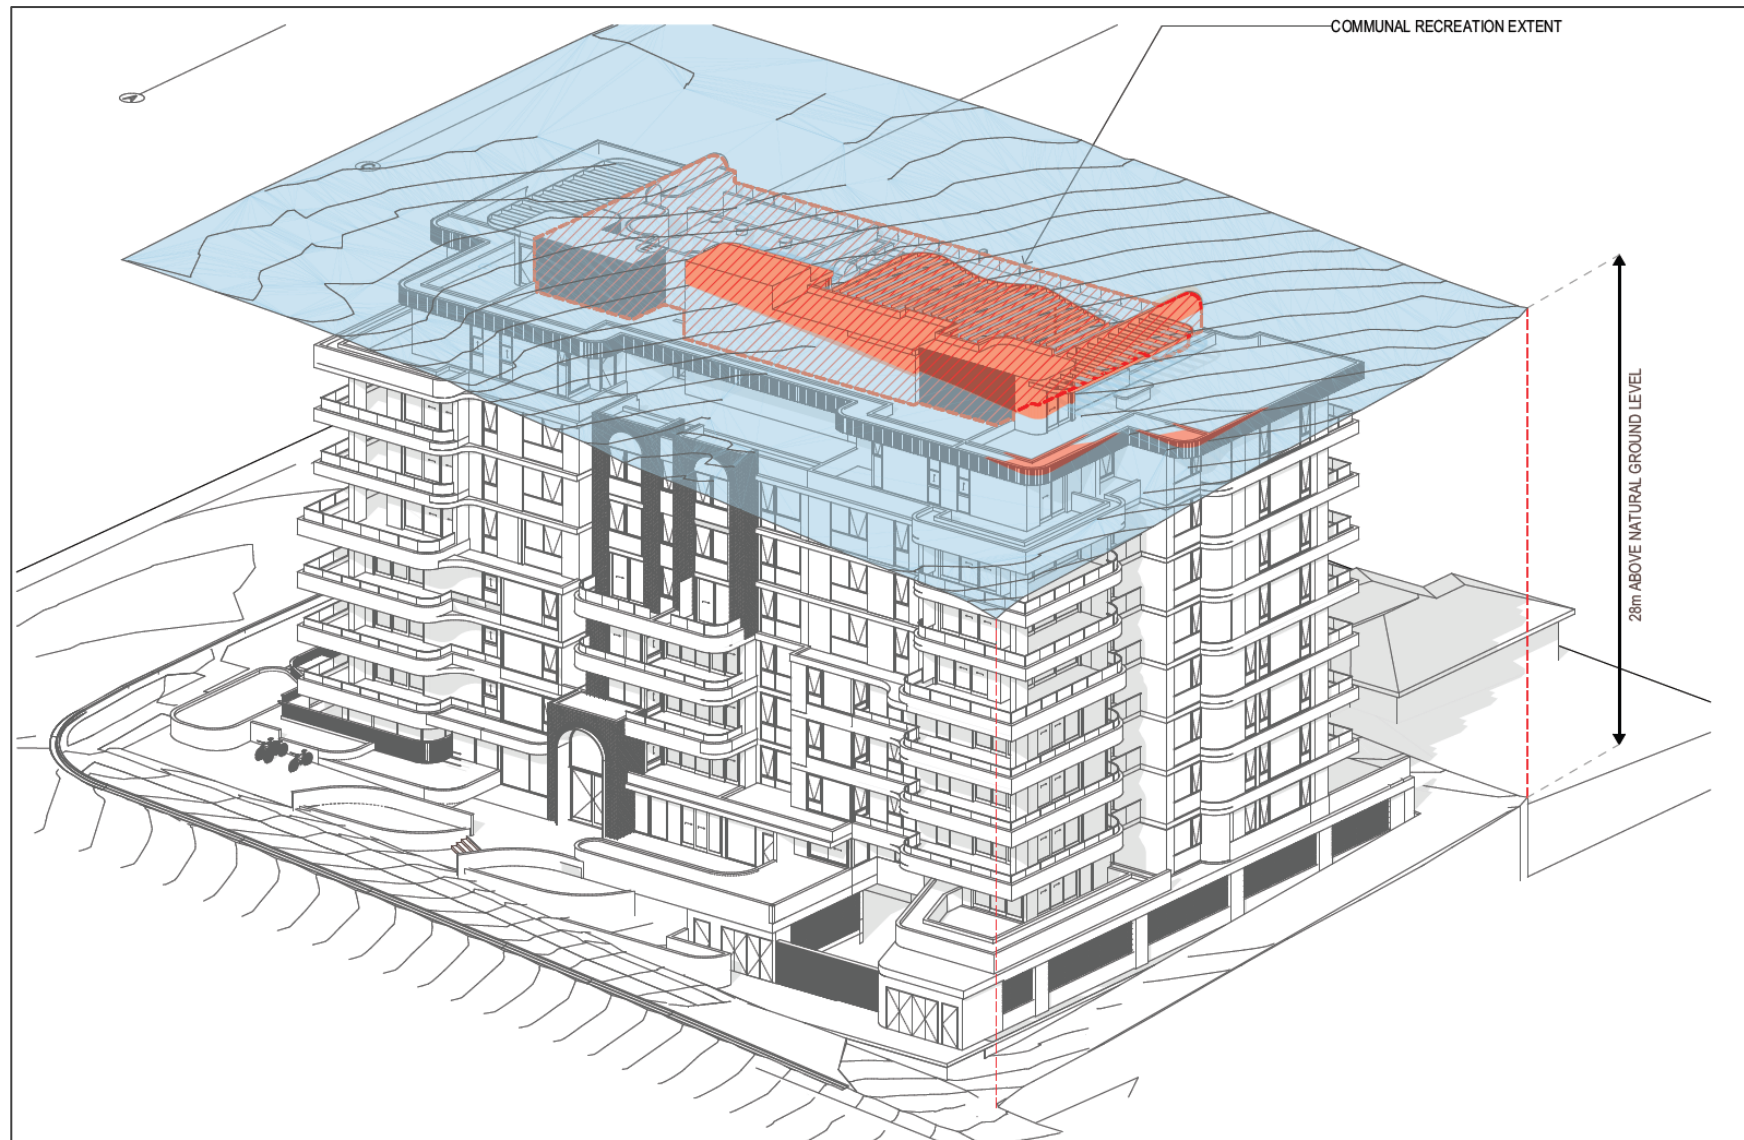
Excerpt from Primary Architectural Plan Set, HAL Architects, September 2025 (3d Height Plane)
